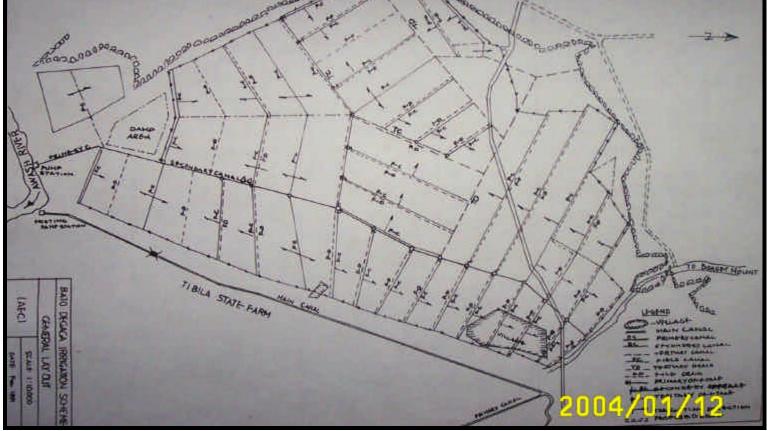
Plan of the Batu Degaga irrigation project (source: ASE, 1990)
